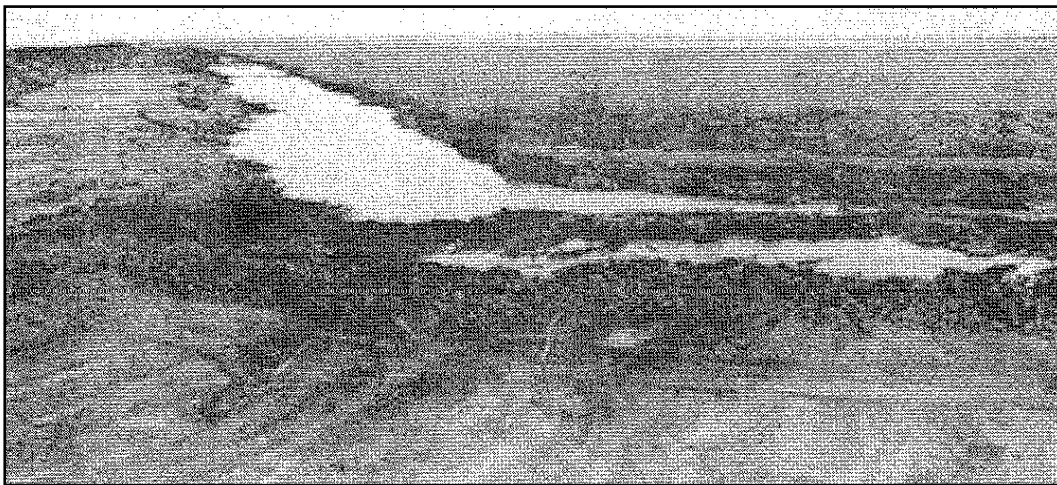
A well-developed perimeter trenching system, Morris Island Disposal Site, Charleston District.
